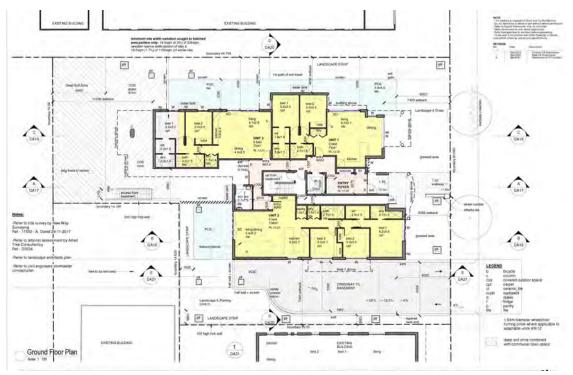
Site Plan - Proposed (Source: Borst & Co Architecture)
